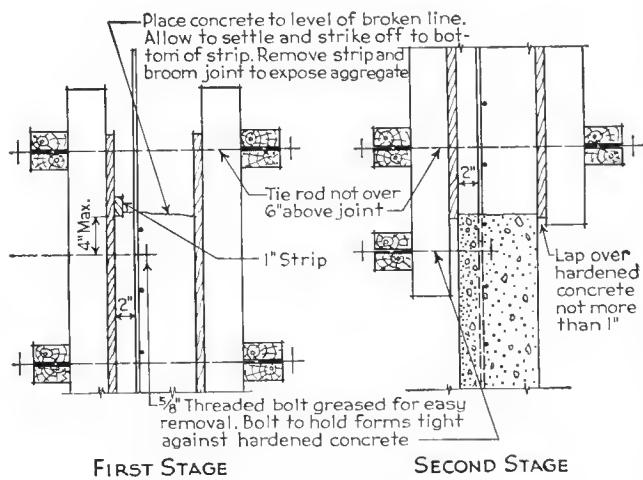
Horizontal construction joints should be made straight and level. By striking off the concrete to a level strip nailed to the form the desired result will be obtained.
